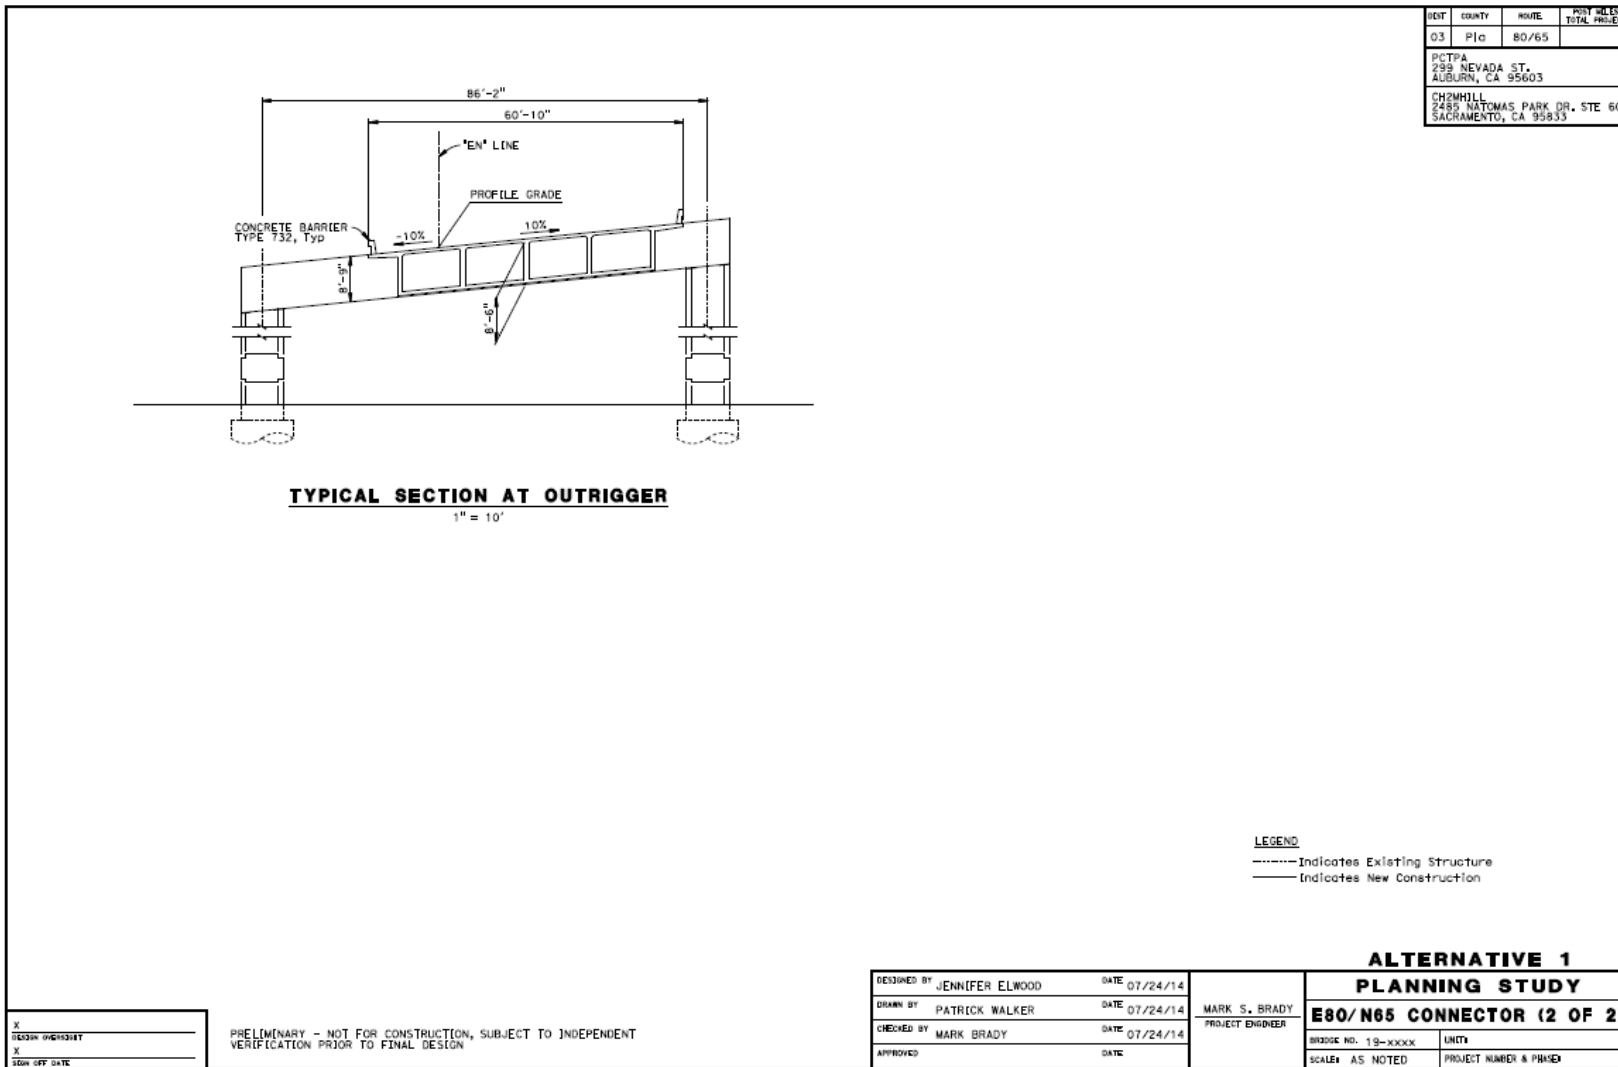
Proposed EN Connector Plan (Alternative 1) (2 of 2)
